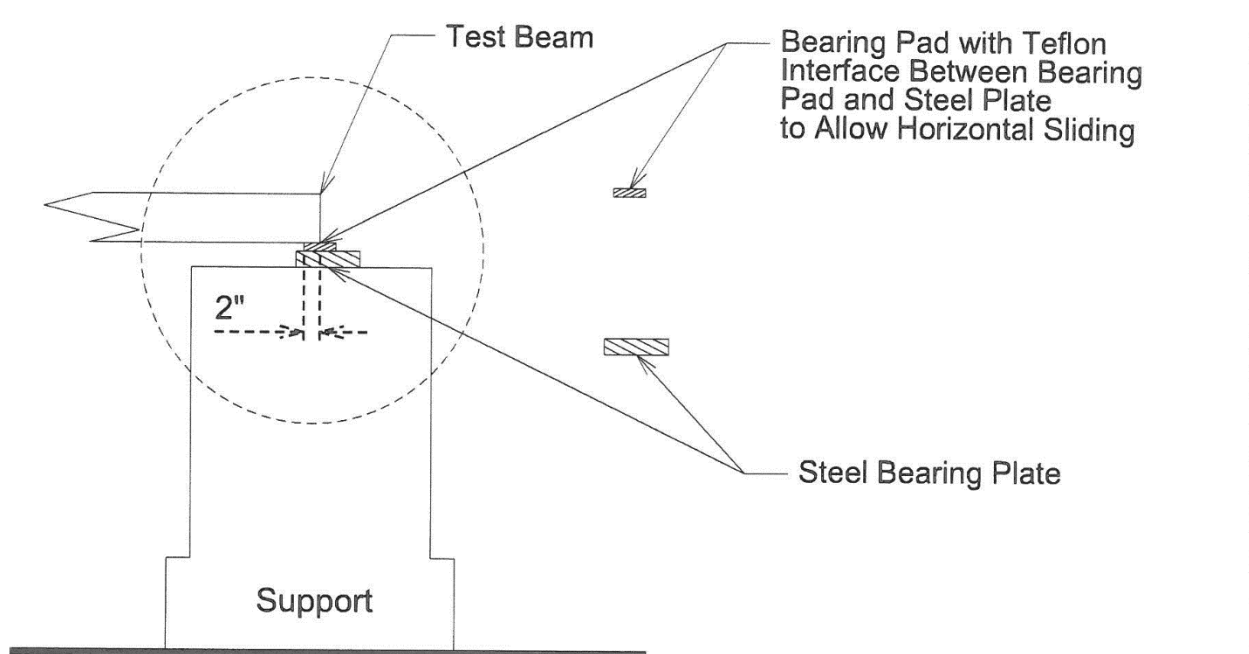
The test setup can be with neoprene bearing pads and bearing plates at each end, or one end of the test setup can have a slide bearing or roller (3 inches diameter minimum), while the other end has a standard neoprene bearing pad. The bearing pad (1 inch thickness minimum) has a Teflon interface on top of a stainless-steel bearing plate (1/2 inch thickness minimum). When this test is carried out at an actual facility, a protective fence and other safety measures should be used. (1 in = 25.4 mm. 1 ft = 0.305m). Dimensional Tolerance: +/- 1/4 inch
